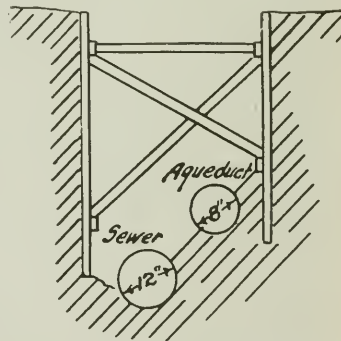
Showing Arrangement of Water and Sewer Pipes
